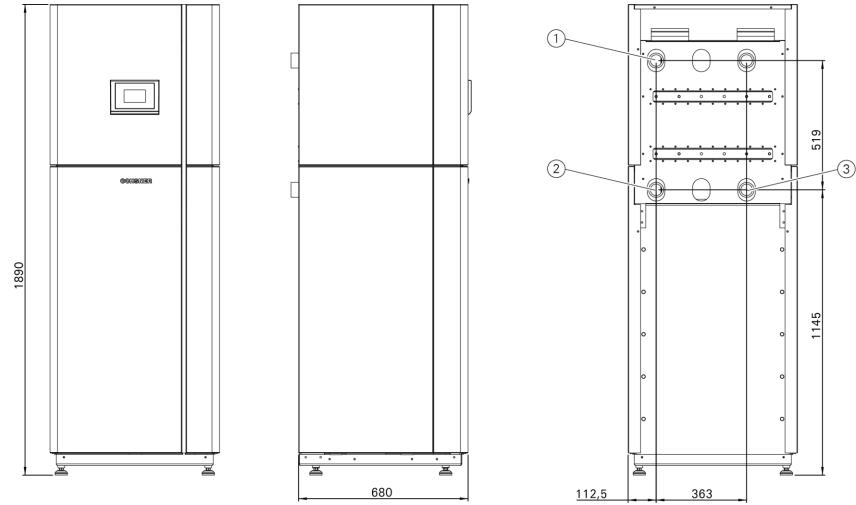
Inside unit dimensions: Heat pump AIR 80 C13A and AIR 80 C22A (in mm)
